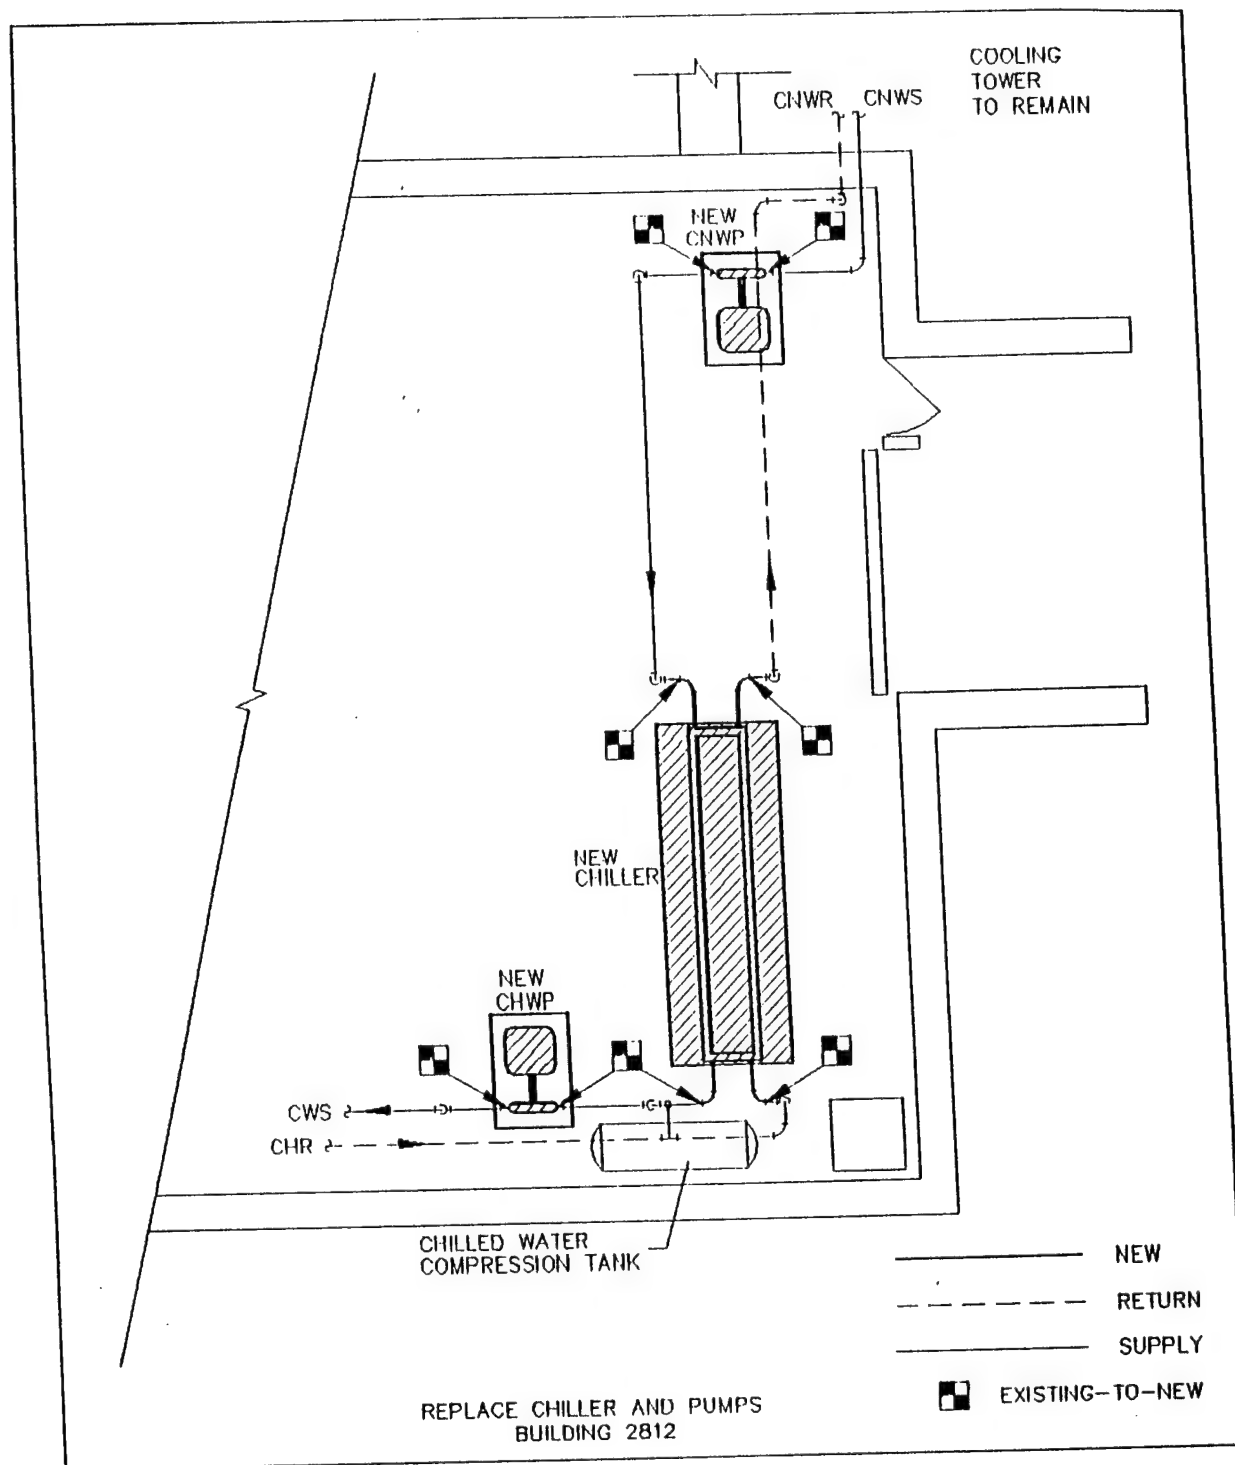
MECHANICAL ROOM LAYOUT, CENTRAL PLANT 2812
